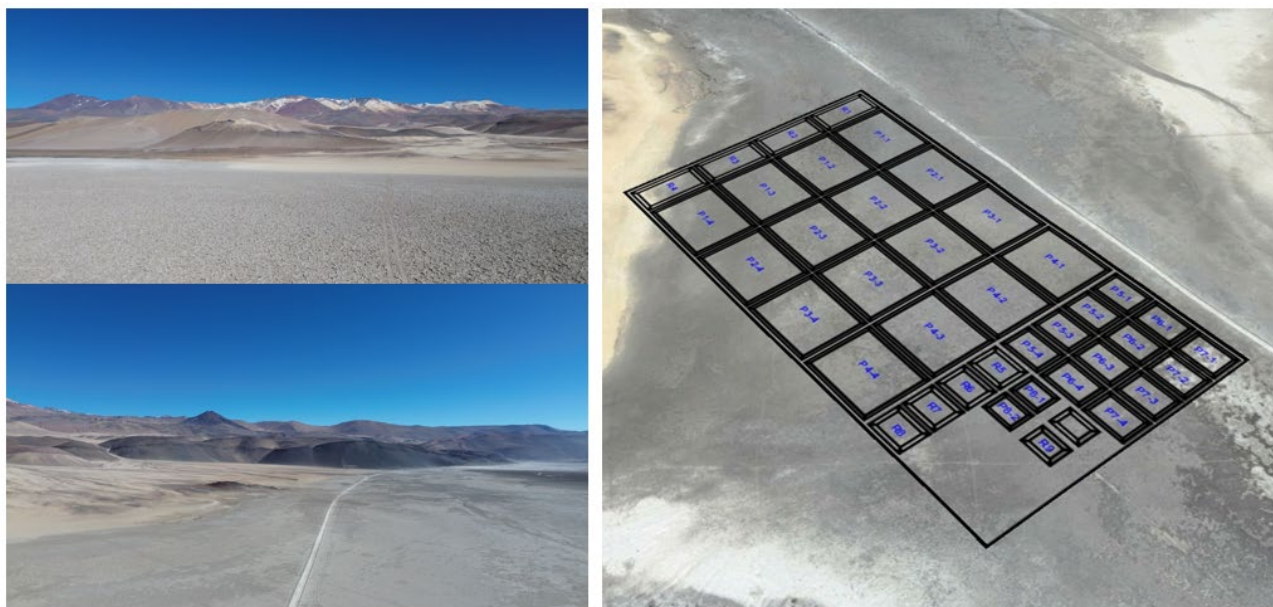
Proposed Pond Location and Layout at Rio Grande Sur
